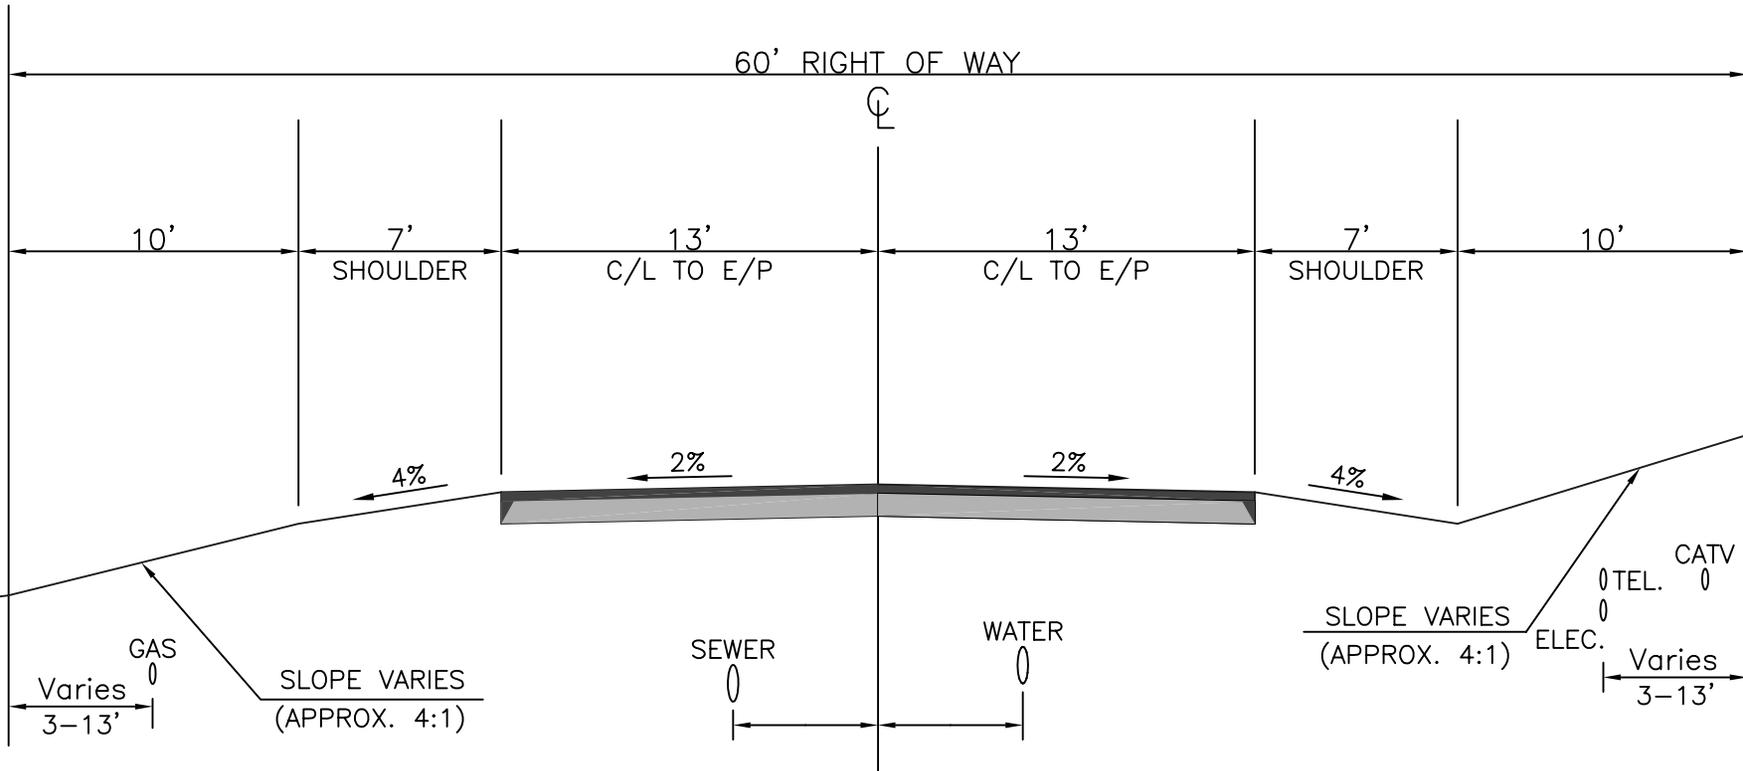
STANDARD DETAIL	STANDARD UTILITY LOCATIONS LOCAL STREET	CITY OF KINGMAN	N.T.S. DETAIL NO. 120
